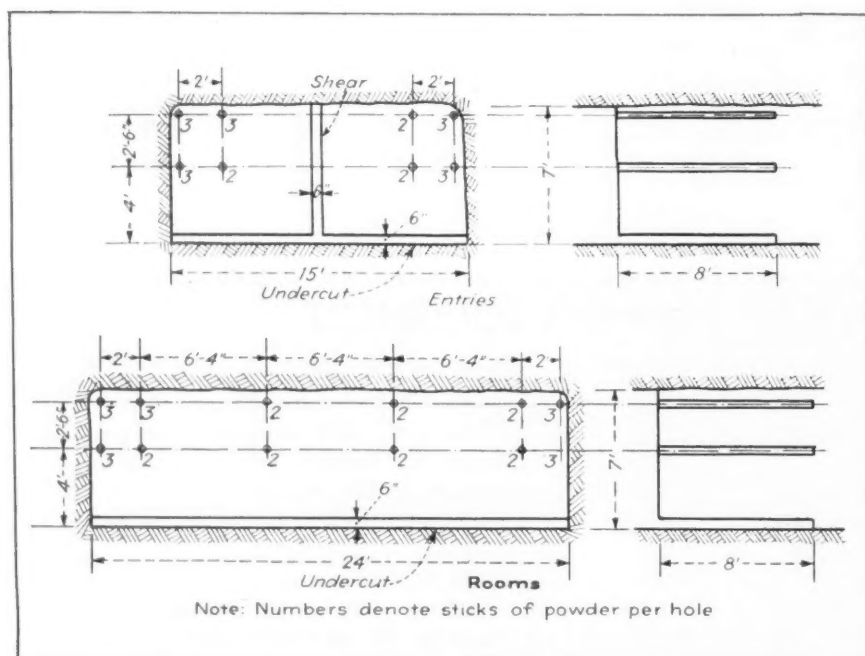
Drilling and shooting plan employed at Sunnyside No. 1 mine.
